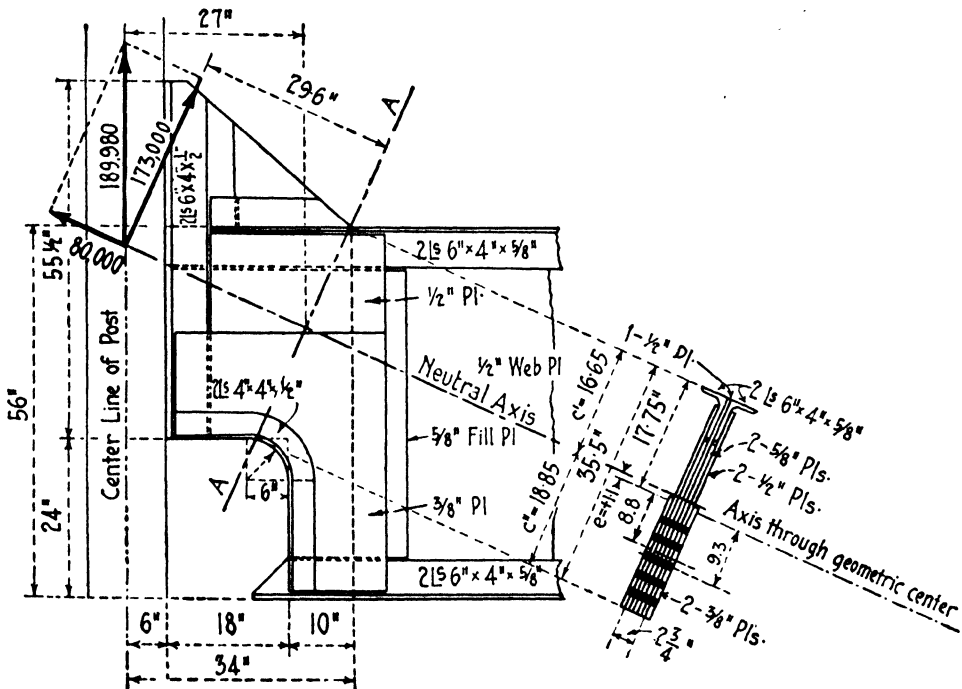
DETAIL OF FLOORBEAM CONNECTION.
